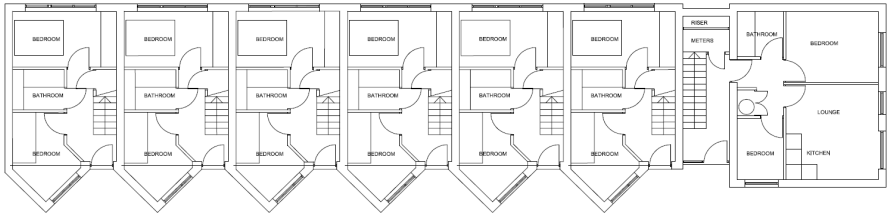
Floor plans of the dwellings (Simon Foote Architects 2008).
